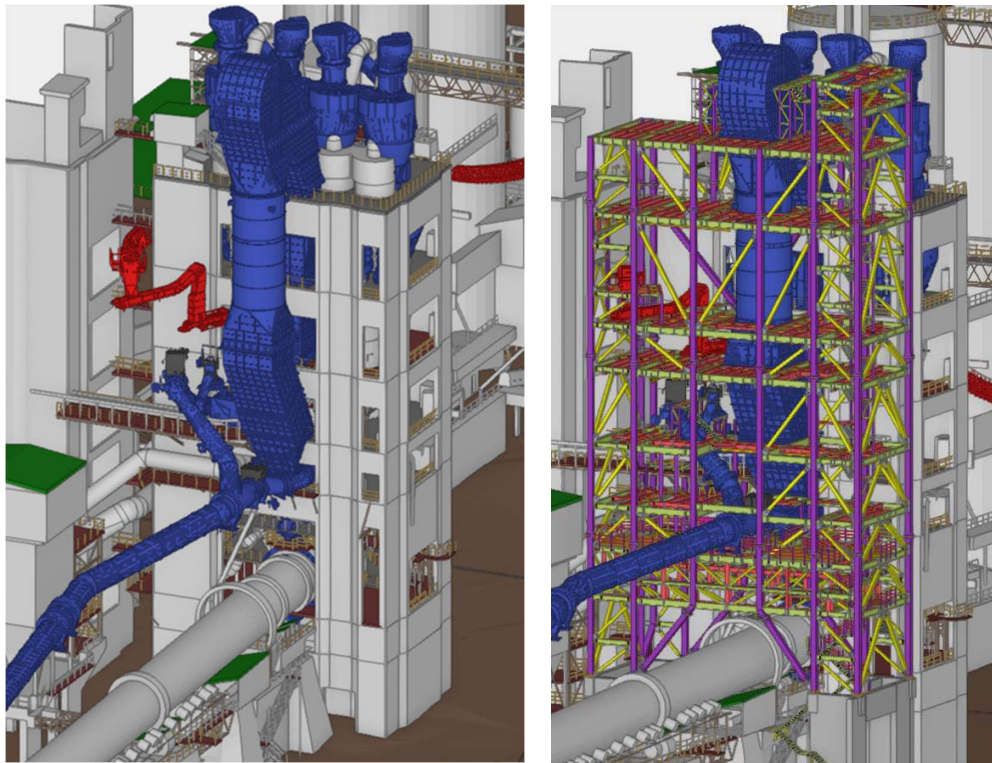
Preheater building with planned new equipment (left) & new structure planned for the support of equipment outside the preheater building (right).
